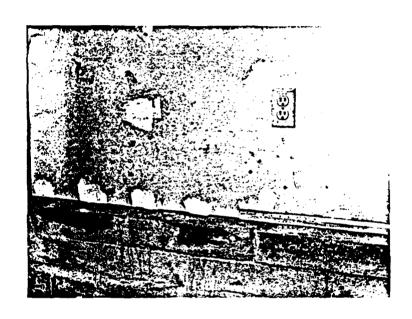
Detail at Electrical Outlet on Interior Side Showing Typical Crack Between "Floor" and Gypsum Board.
